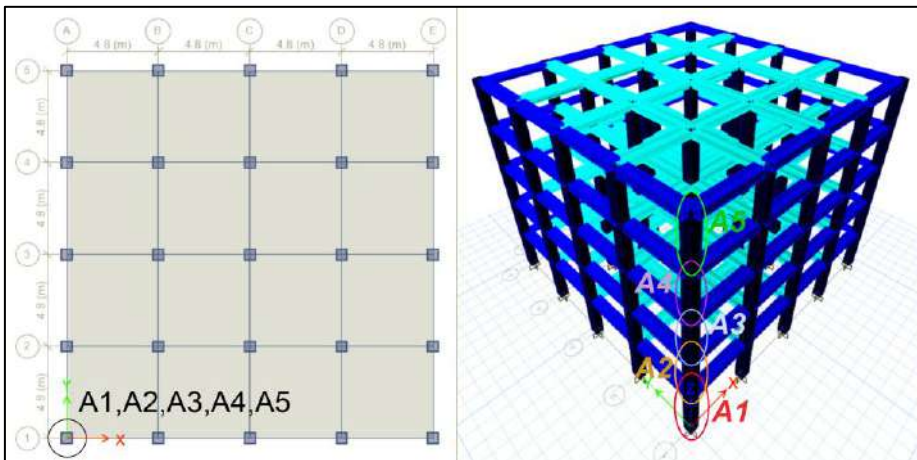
Building plan with marked removed columns (left) ; Structure model (right)
